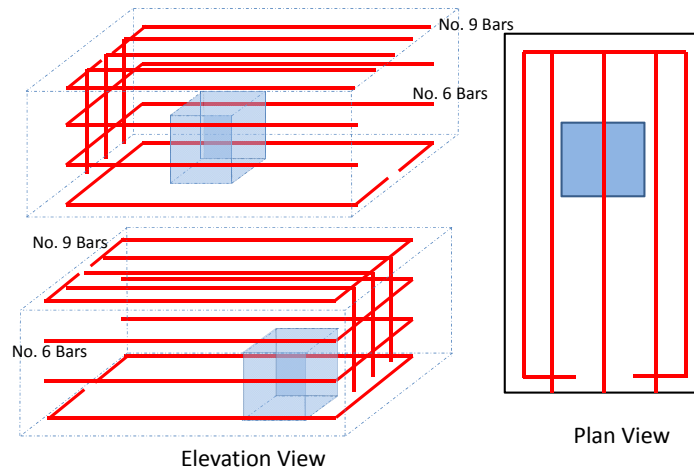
Reinforcement Modifications - Three Pile Specimen
